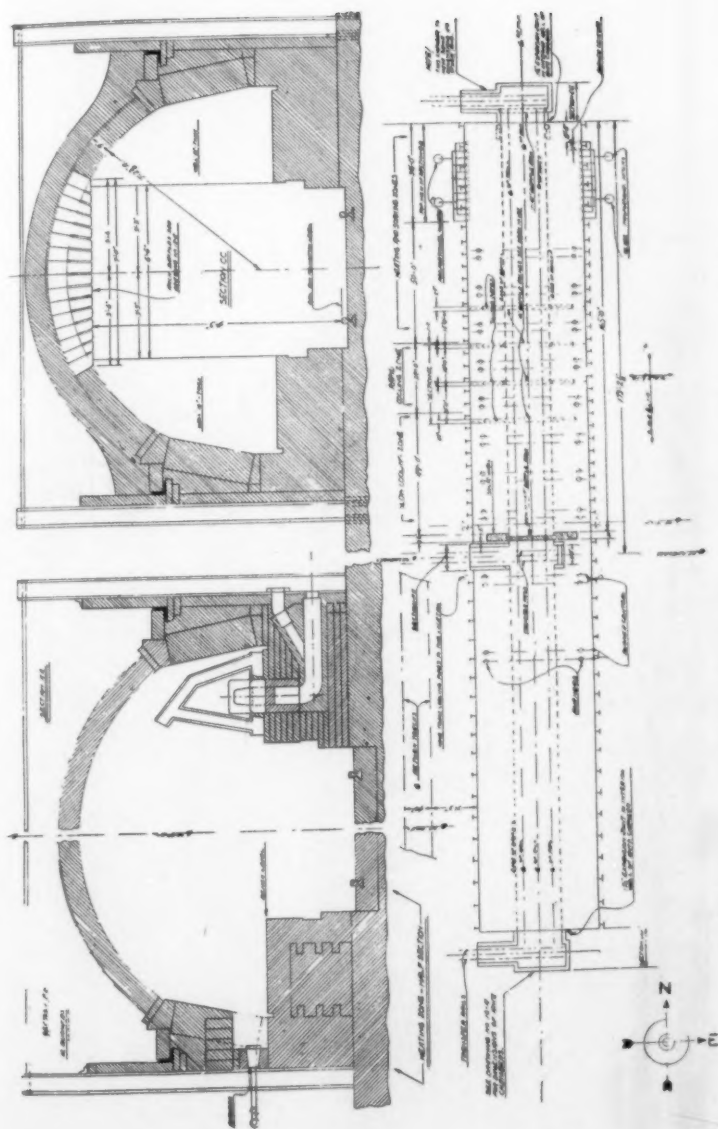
CROSS SECTION OF REDESIGNED HEATING ZONE OF SHORTENED KILN.
